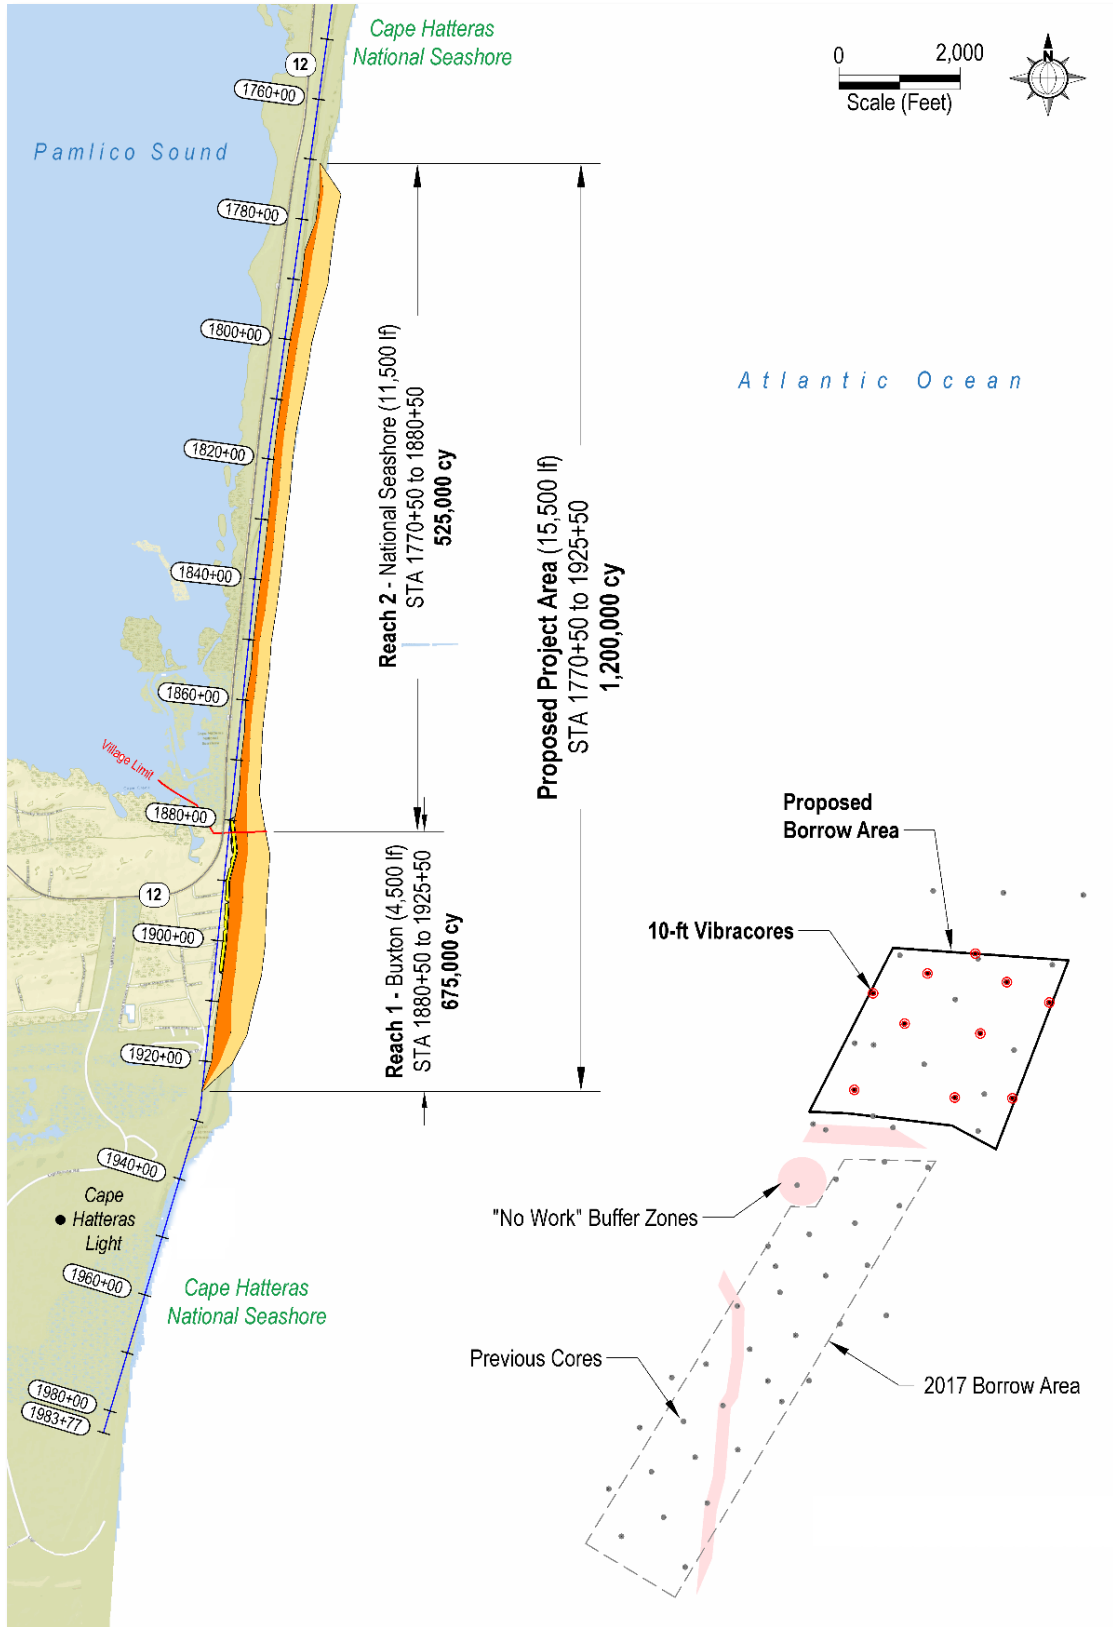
Plan view for the proposed project within the Village of Buxton including the including the project limits, main placement area and borrow areas.
